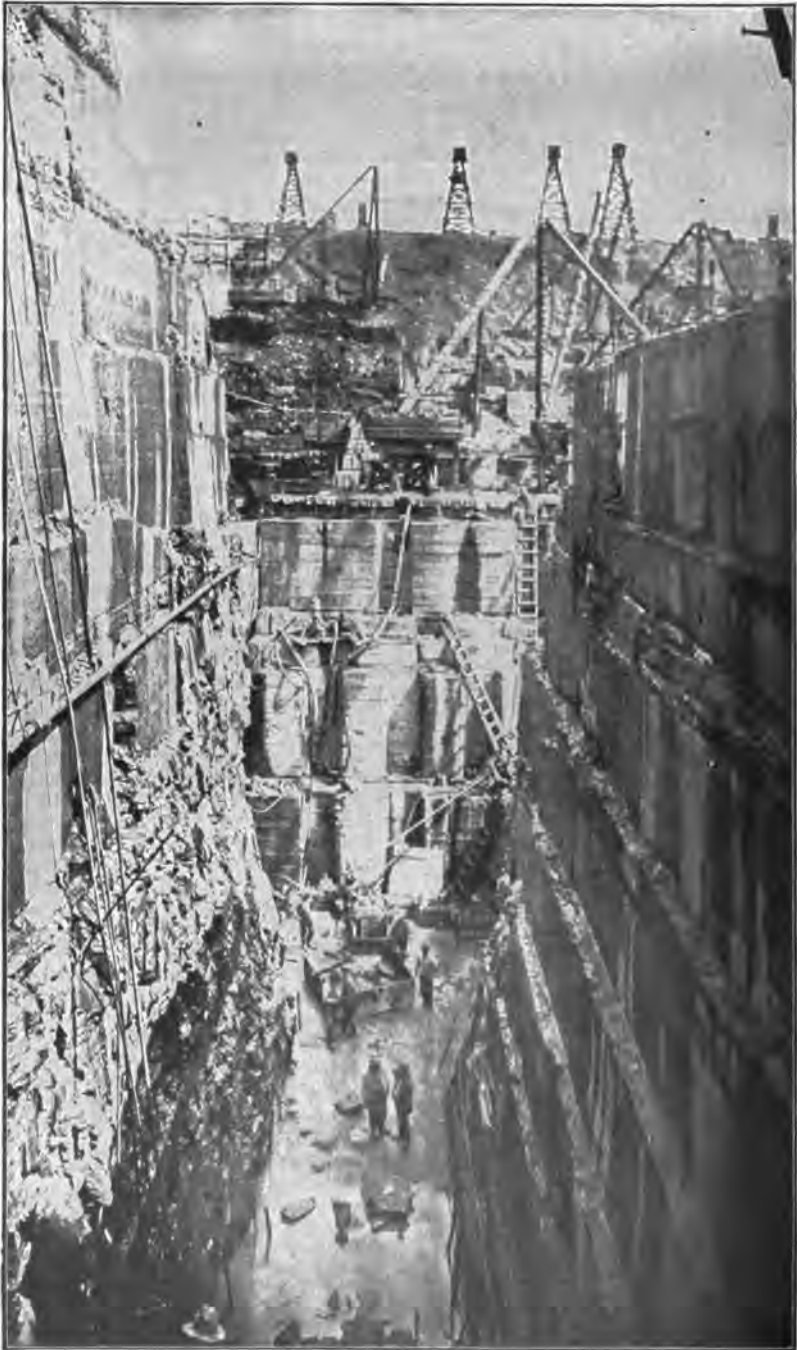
Cut-off Trench, Olive Bridge Dam. Shows Channeled Rock and Masonry in Trench; also Main Cableways and Derricks.
